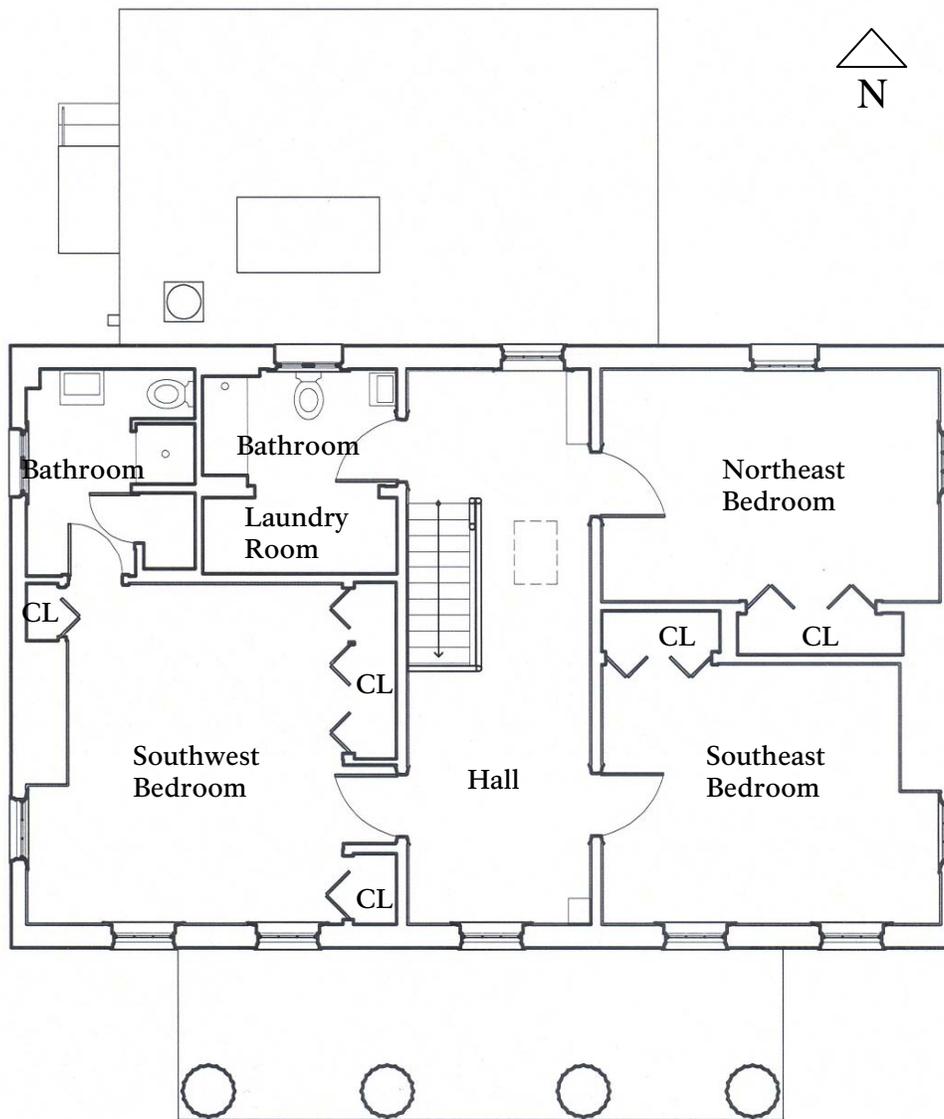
Second floor plan of the Hunt House, December 2006. Room names added by Barbara Yocum. Not to scale.
